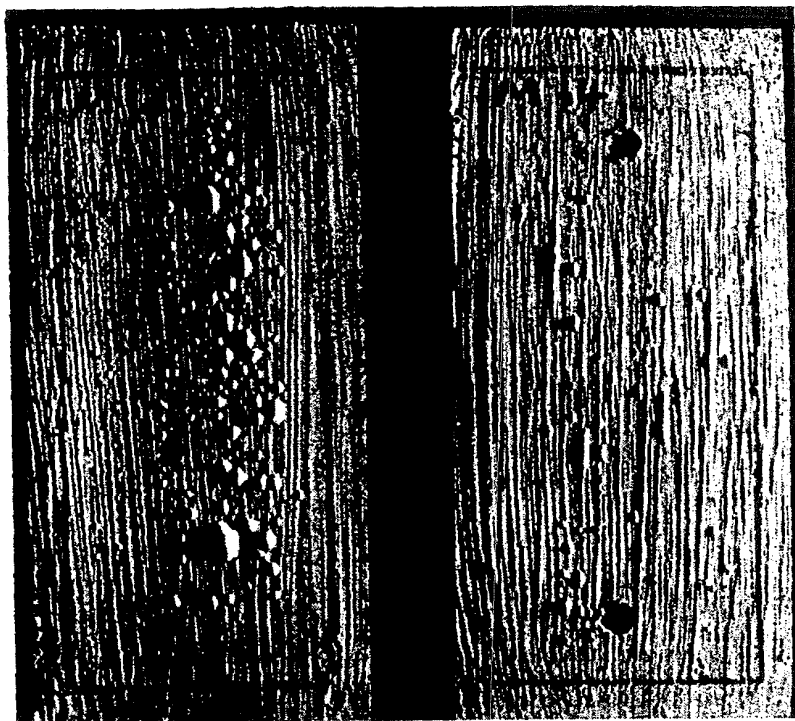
Venting wall space by two openings reduced but did not prevent blistering.
